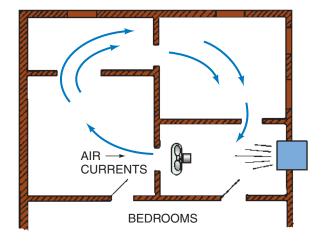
A floor fan may be used to circulate air to adjacent rooms.
